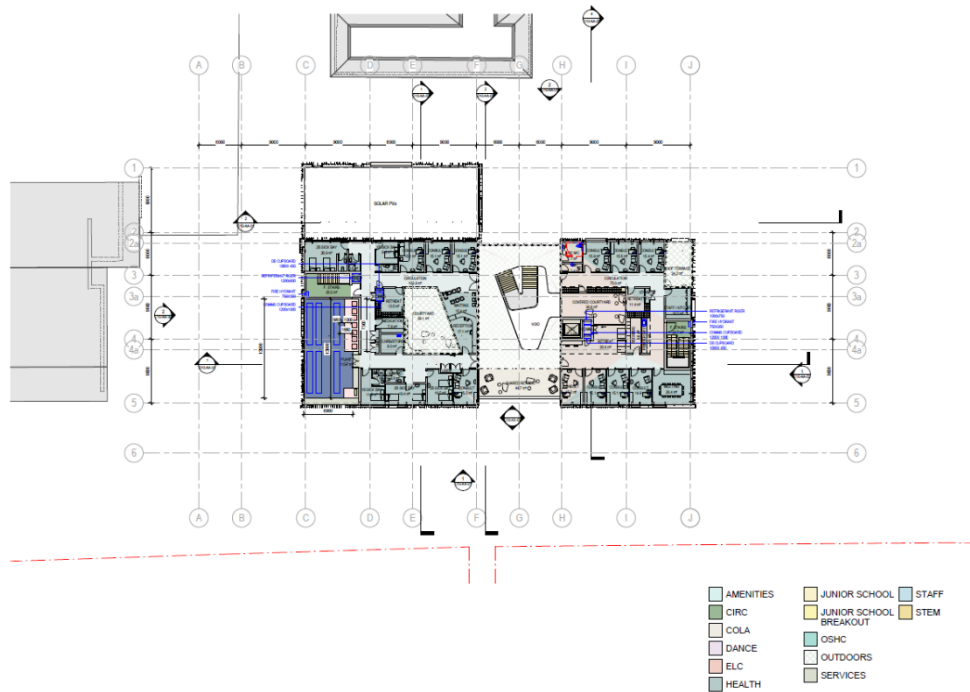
Proposed General Arrangement Plan - Level 04. (Source: BVN)
